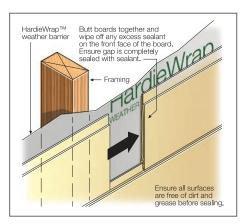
OFF STUD JOINTING (STEP 2/2)
